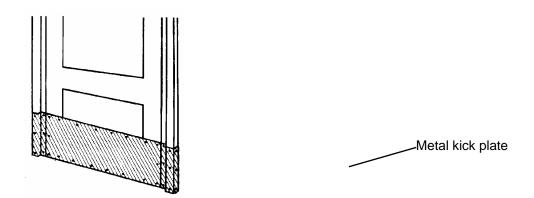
Wooden doors and door frames need to be protected against chewing by rats and mice
